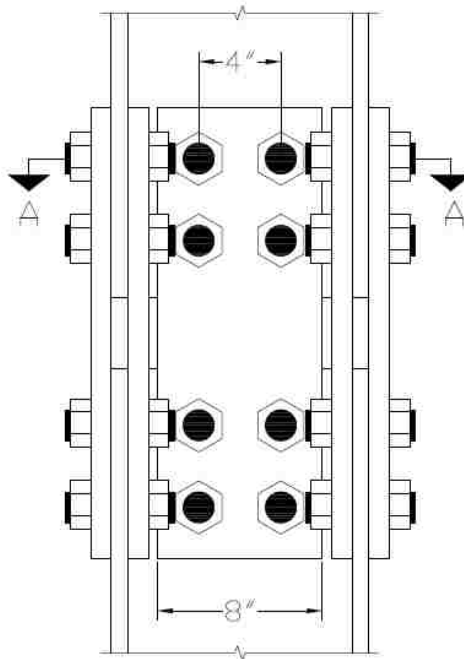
Bracing Frame Repair (Detail 1 of Figure 4.33) South Elevation
